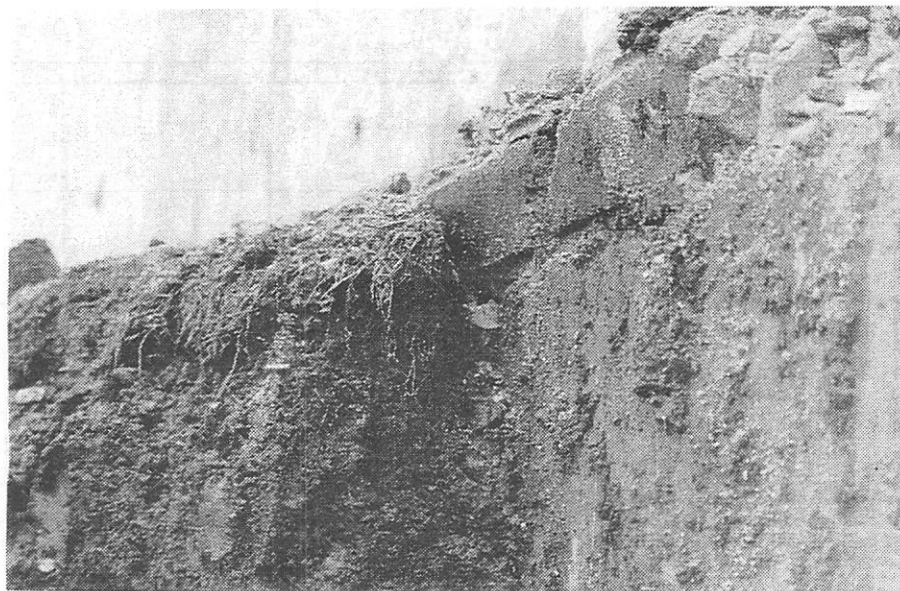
Existing ground elevation higher than foundation wall at west elevation - typical all around building.
